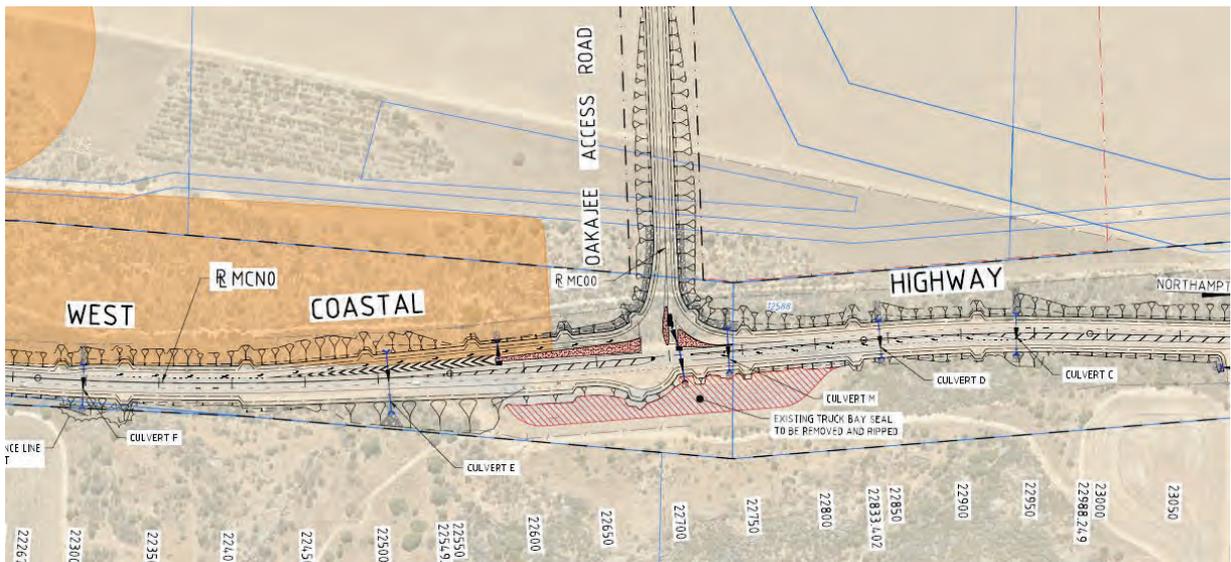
NWCH/OIE intersection – under construction (Source: Main Roads WA September 2024)
